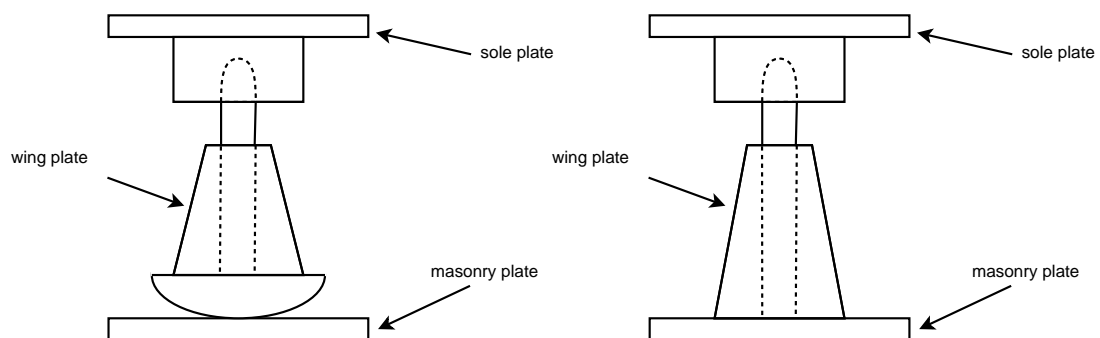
Schematic view of an expansion rocker bearing (left) and a pinned rocker bearing (right).
